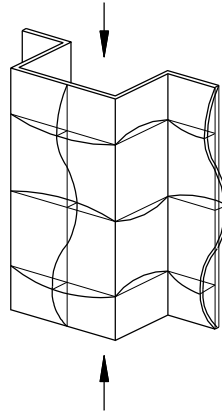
Local buckling of component walls of a cold-formed thin-walled section
